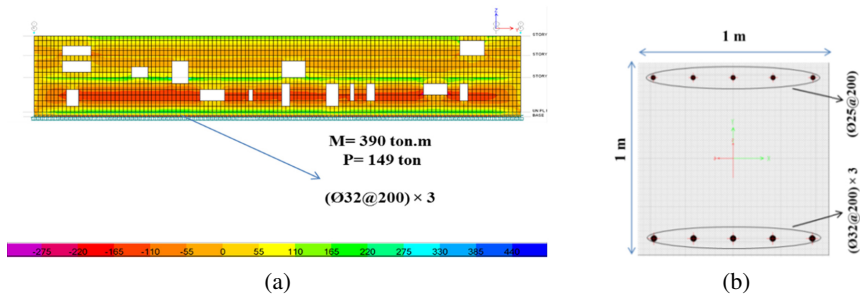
(a) The values of bending moment and axial force and (b) the designed cross-section wall with C25 concrete
